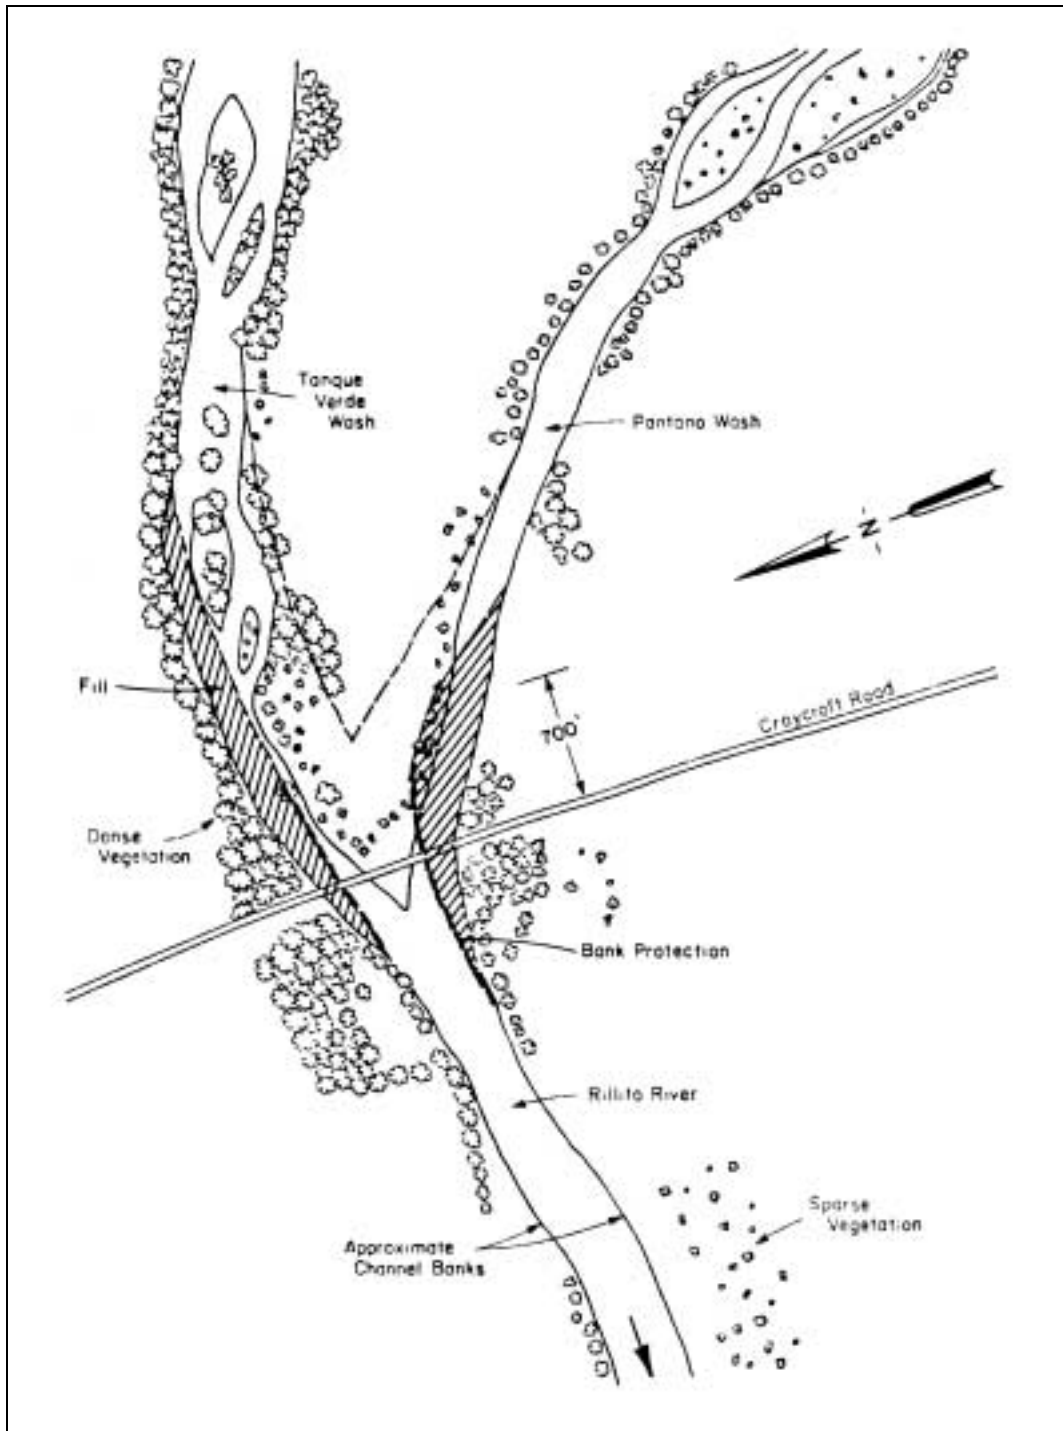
Alternative III for Craycroft Road Bridge crossing.
